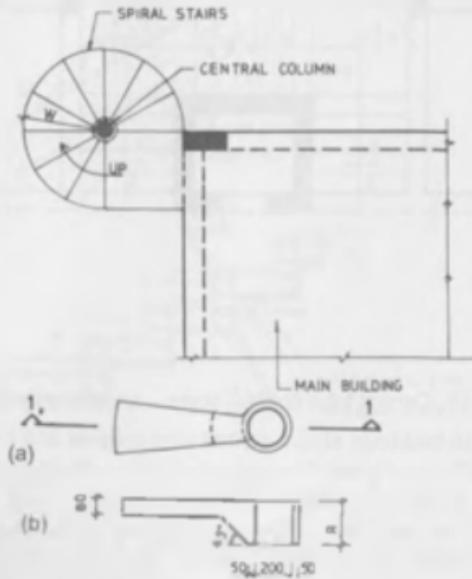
Spiral stairs. (a) Plan of precast step; (b) Section 1-1.
